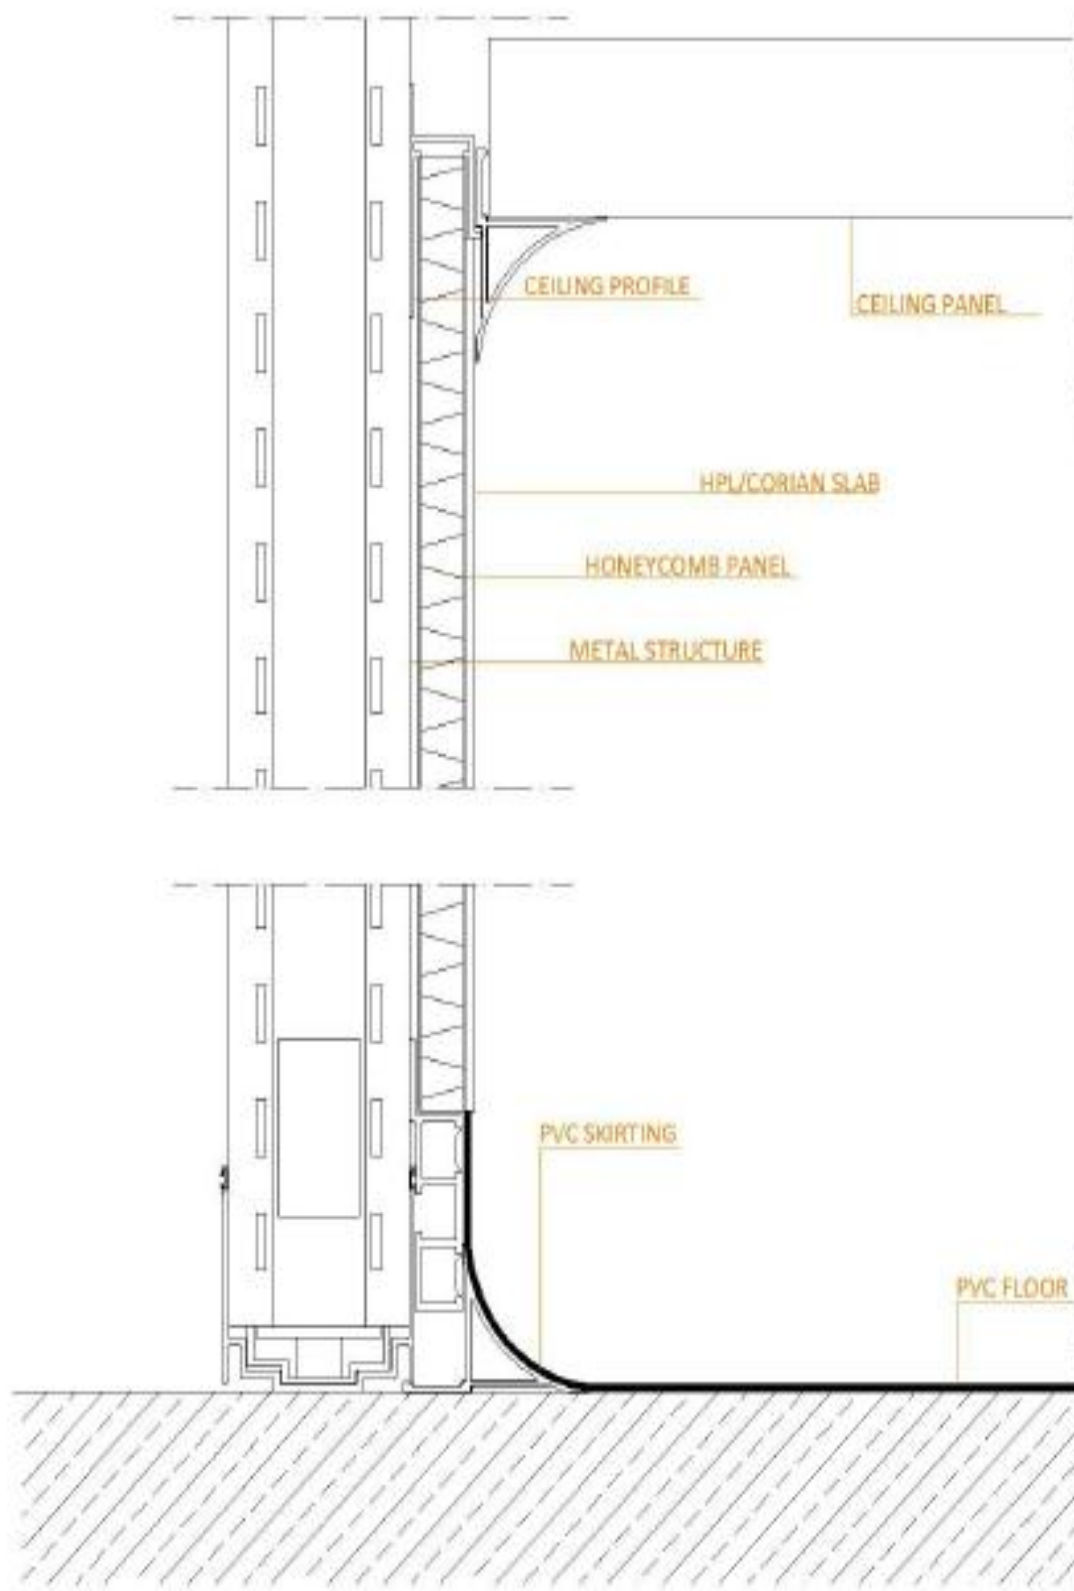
FLOOR –WALL –CEILING with partition wall
